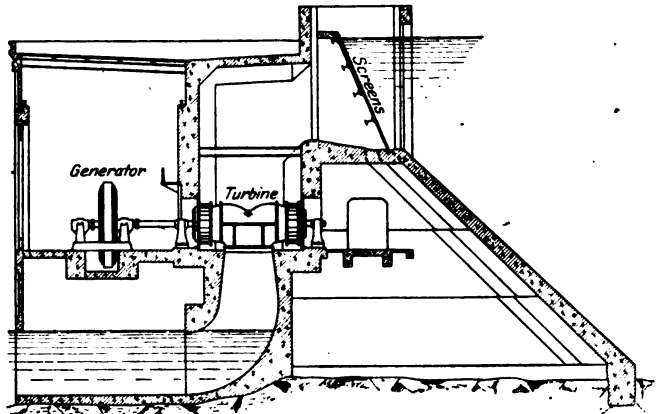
Sectional Elevation of Cedar Falls Power House.
